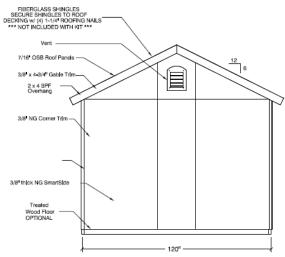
EXHIBIT C: ELEVATIONS OF NEW REVISED PROPOSED SHED
